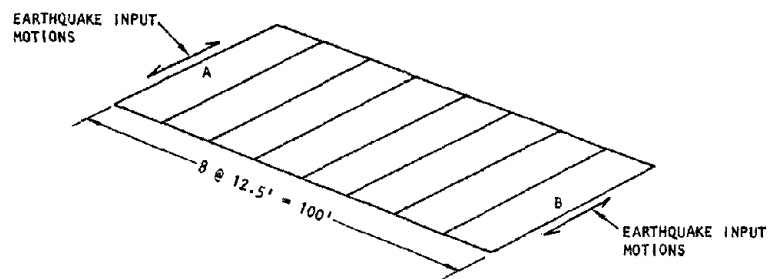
ONE-STORY UNREINFORCED MASONRY BUILDING WITH A WOOD DIAPHRAGM ROOF
